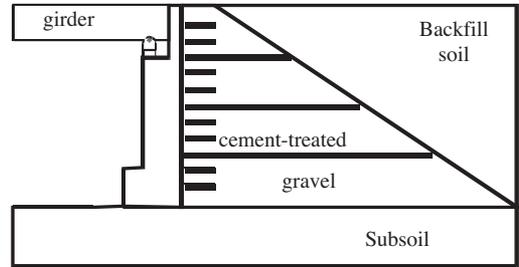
GRS abutment having cement-treated gravel for reinforced backfill (Aoki et al., 2005).
